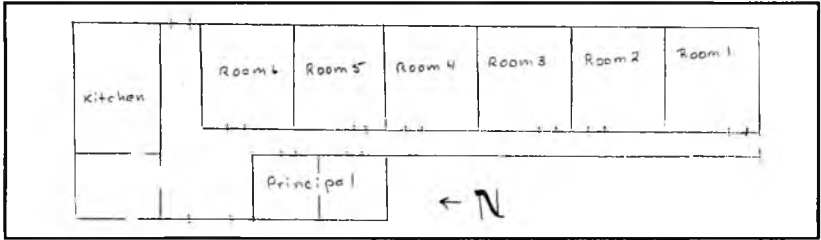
Monte Sano Elementary School, floor plan 1959.
